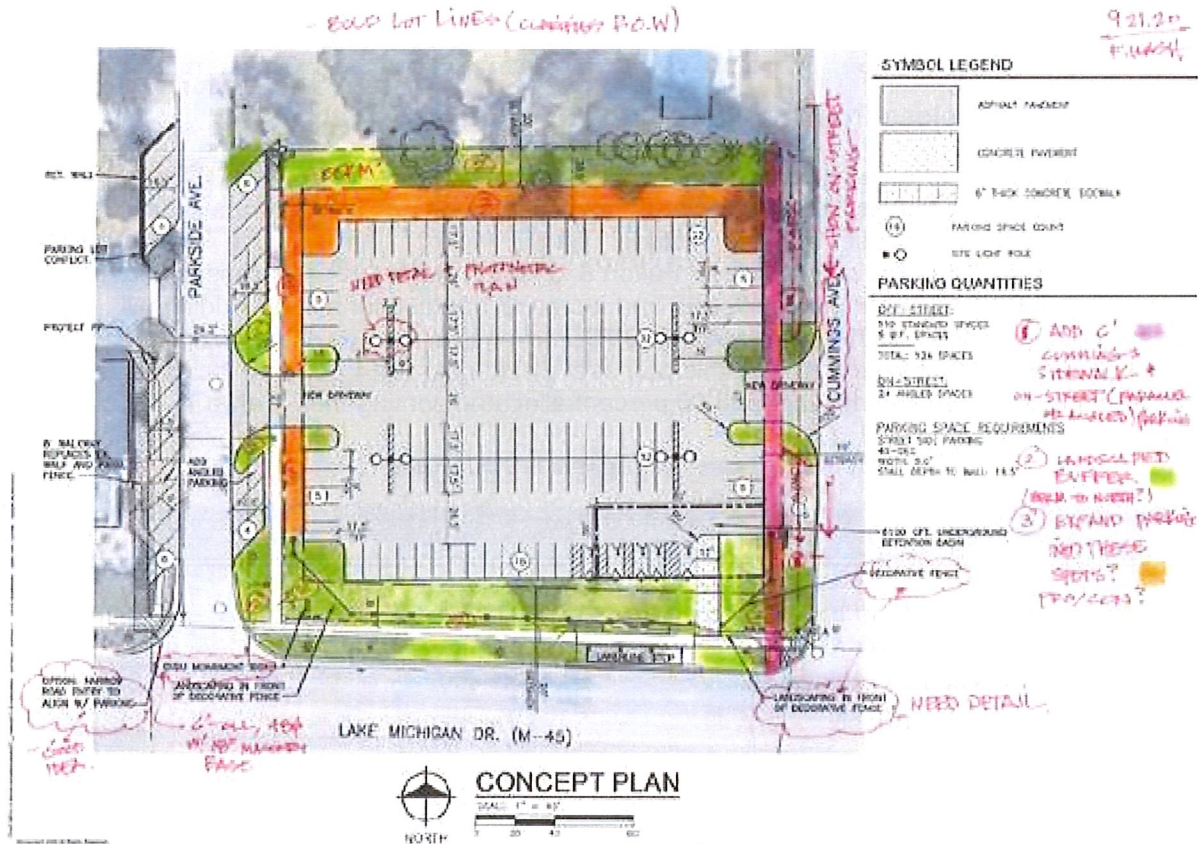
Conceptual plan for Cummings Ave. park & ride facility
